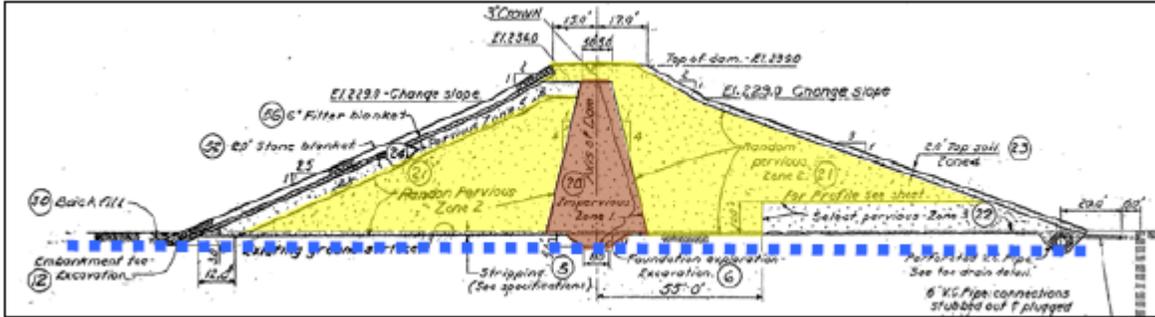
Failure Path for Backward Erosion Piping in the Central and West Foundations.
